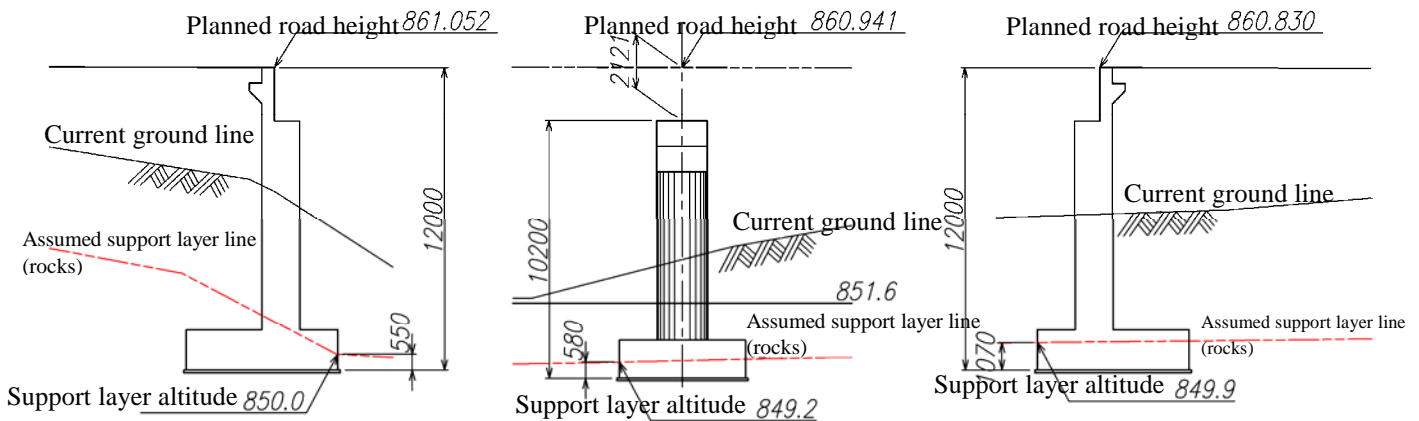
Substructure Work Geometry and Structural Height
